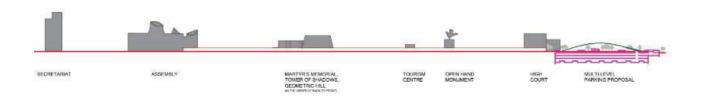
Cross section of the Capitol complex site showing the proposed project © HIA Team
